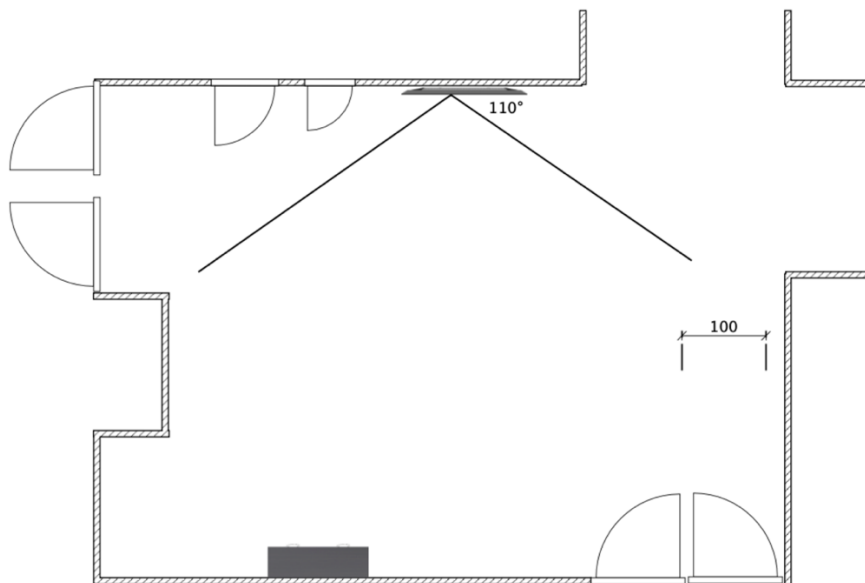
Building 41, ground floor – an entrance area with (paper) bulletin boards relevant for the students in the department – one large workshop room nearby (exit on the top)
